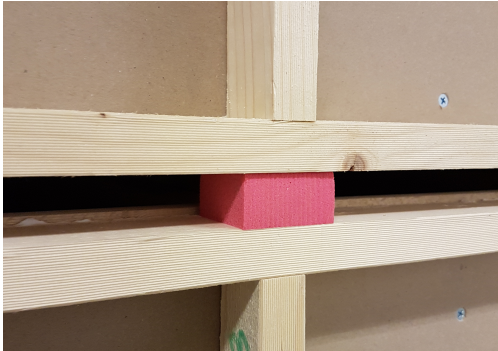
Photograph of the elastomer blocks placed between the walls of the two stacked rooms.
